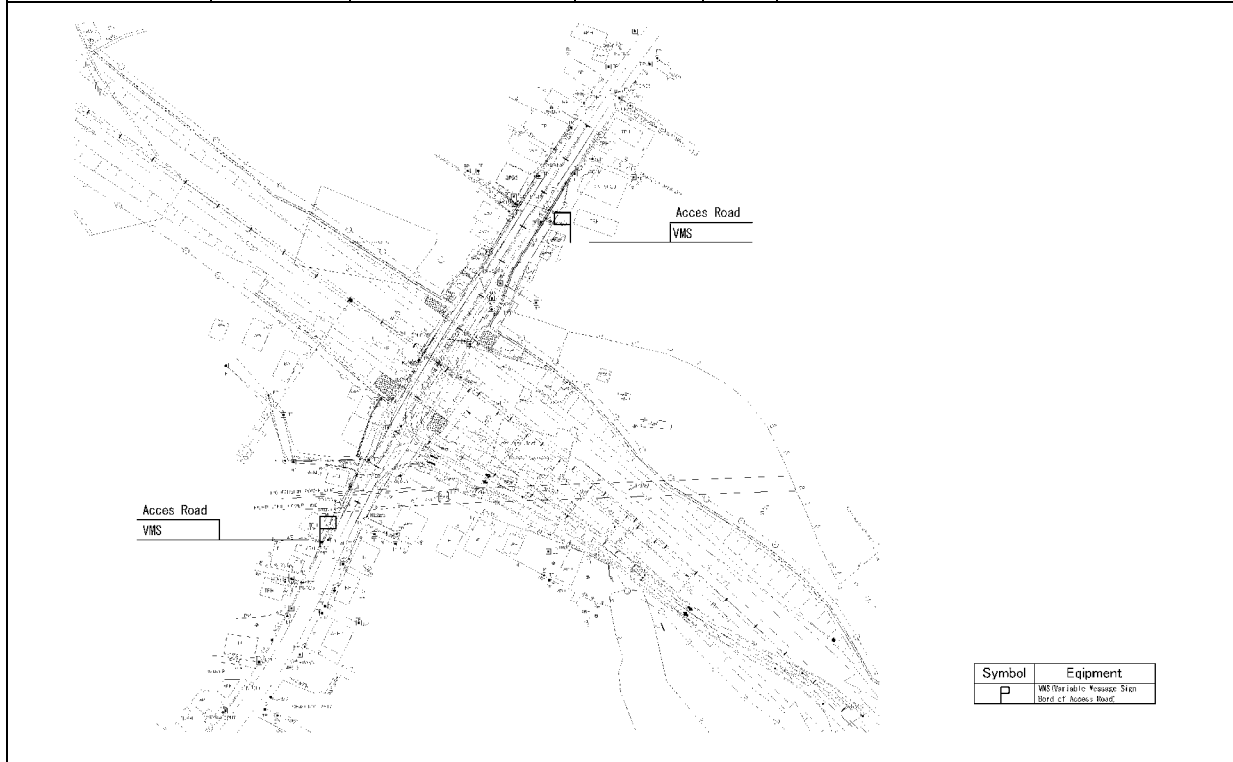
Road side equipment layout plan (Kaduwela IC)
